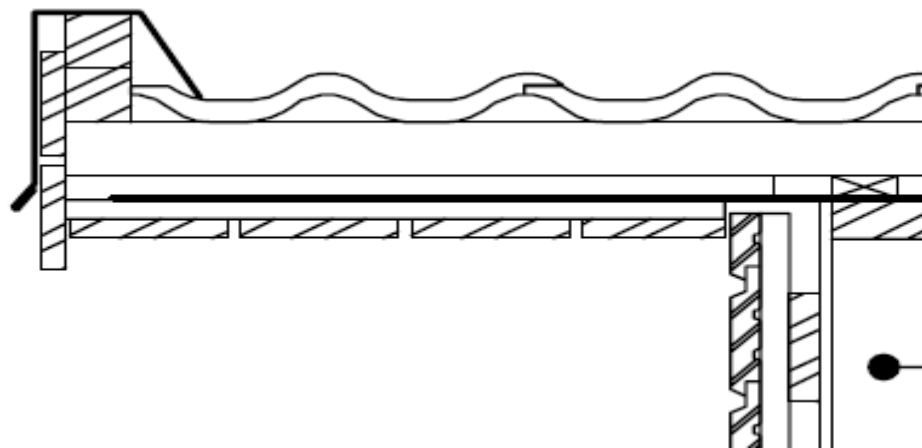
Detail drawing of the upper edge panels on short eaves. Nieminen A. 2014. Detail drawing 4.17.
